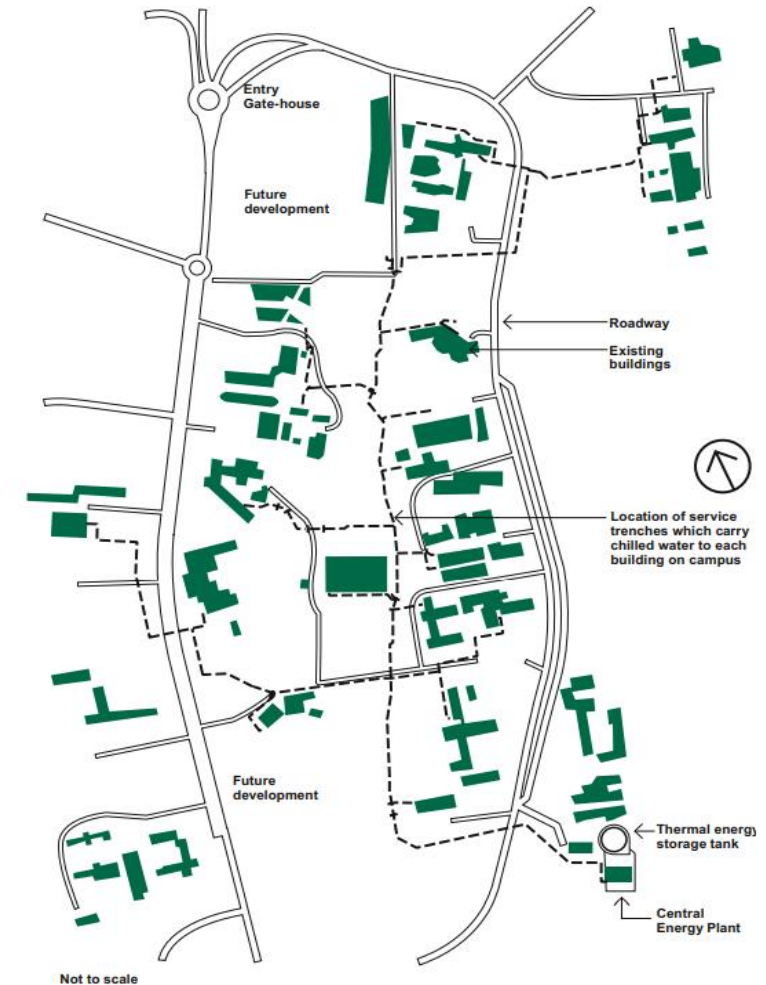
Site Plan of James Cook University, Townsville Campus. (Source: MGF, 2008)
